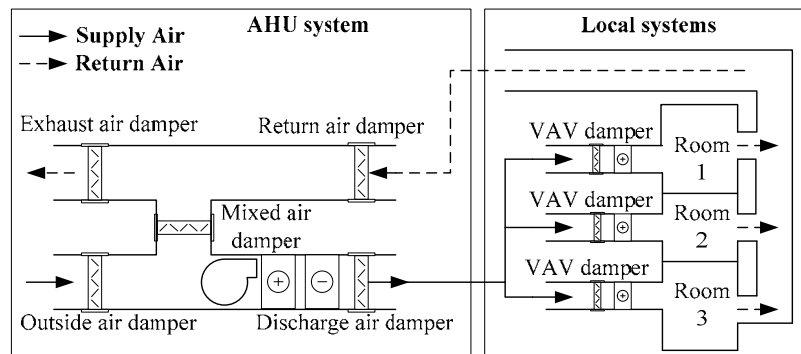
Schematic diagram of a typical single duct, VAV reheat HVAC system.
